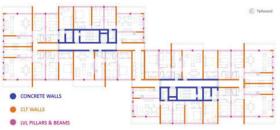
Plan with CLT walls and two reinforced concrete cores.
